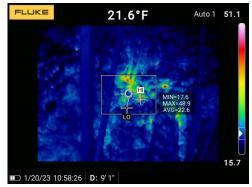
The Surface Temperature of the Roof Decking at 65°F (left) and the Bare Wood Attic Floor and Uninsulated and Unsealed Wall
